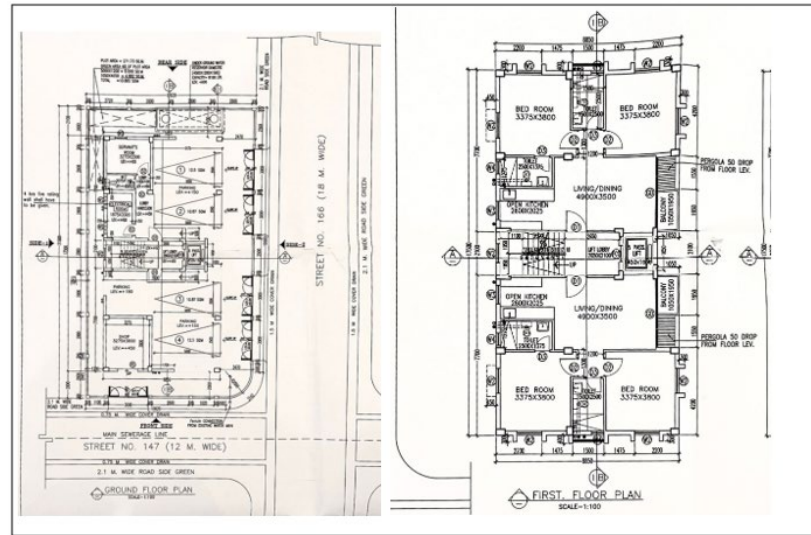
Ground Floor Plan &amp; Typical Plan for 1st, 2nd and 3rd Floors
